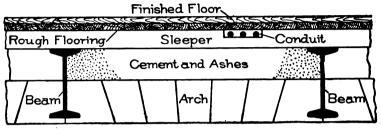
Running Conductors Concealed under Floor in Fireproof Building.
